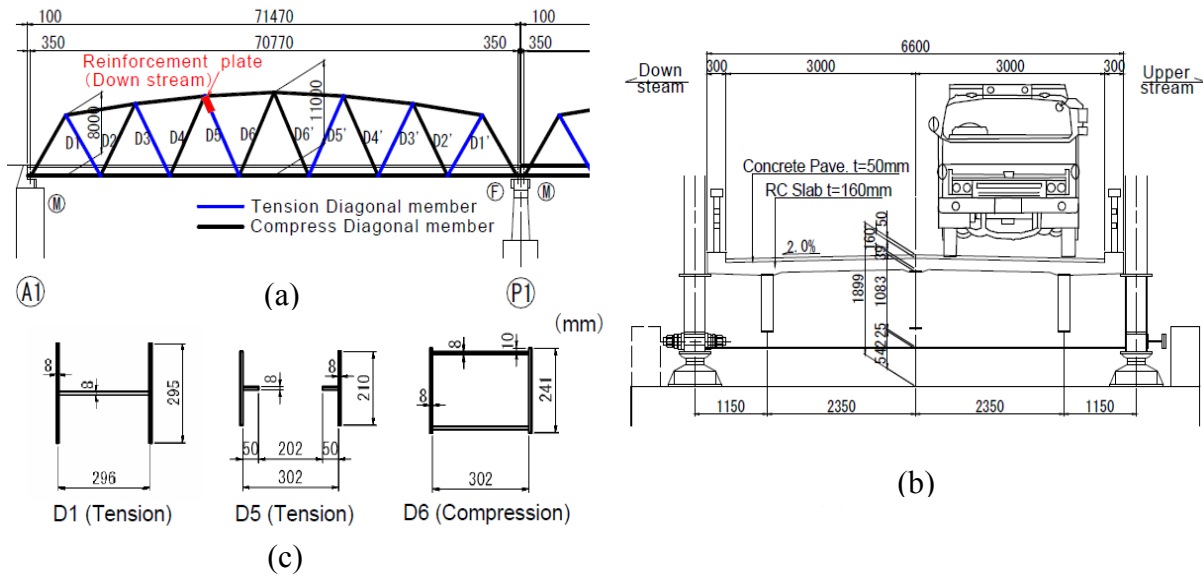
Studied steel truss bridge; (a) Side view of the first span; (b) Cross section of bridge and (c) Cross section of diagonal members. All the units are in millimeters. [28]
